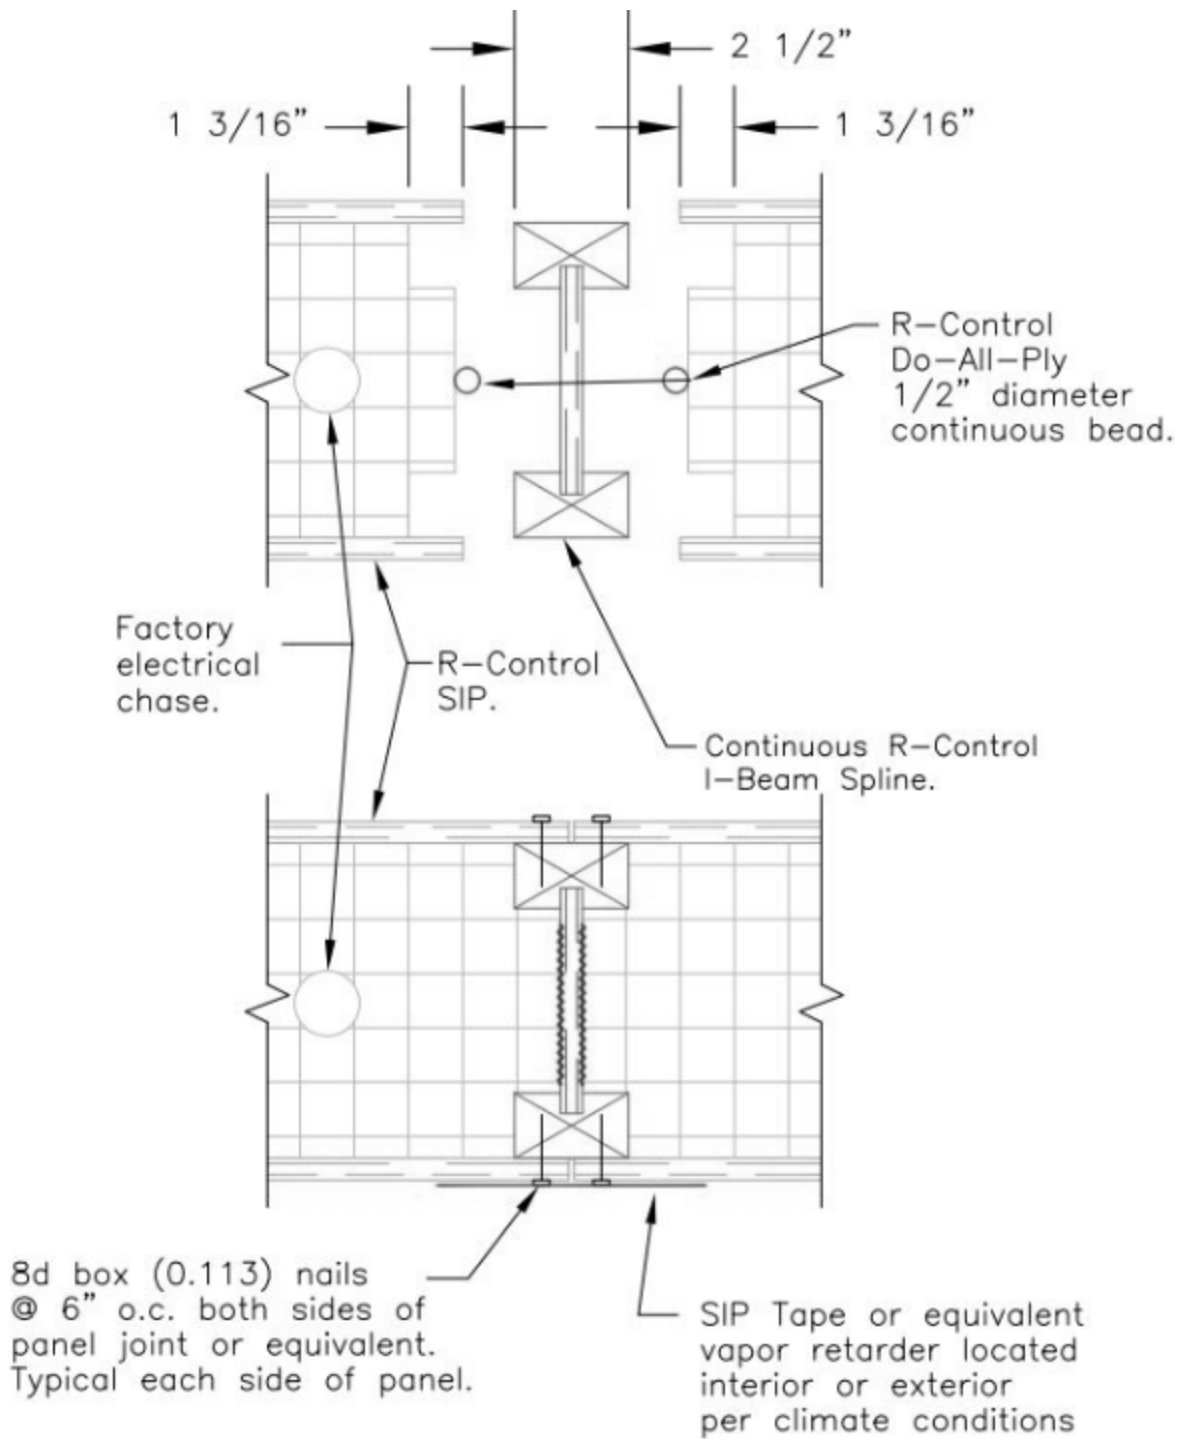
Foam Cutout + Wood I Beam Spline Wall Connection Method
